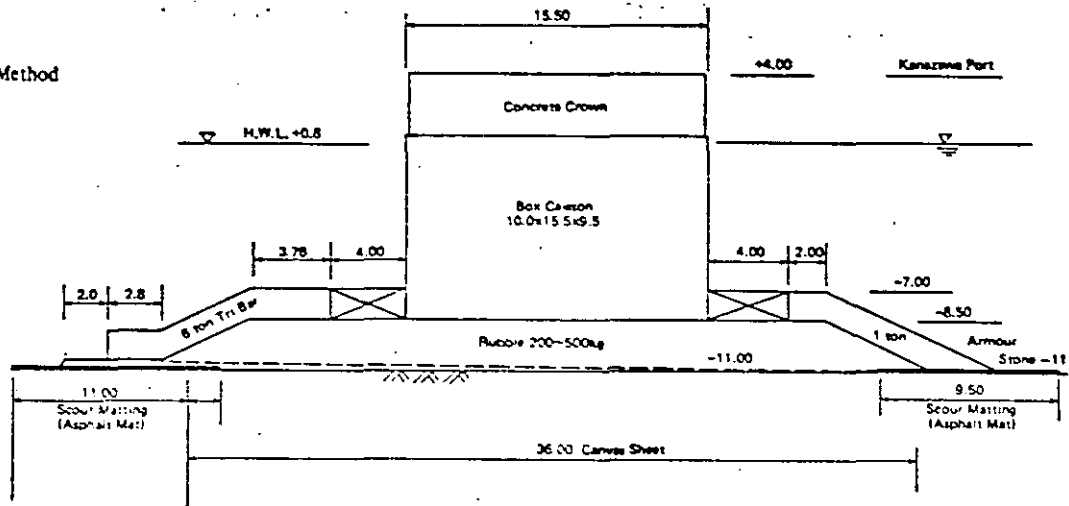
Protection Method for Inside Scouring of Slooping Type Breakwater
